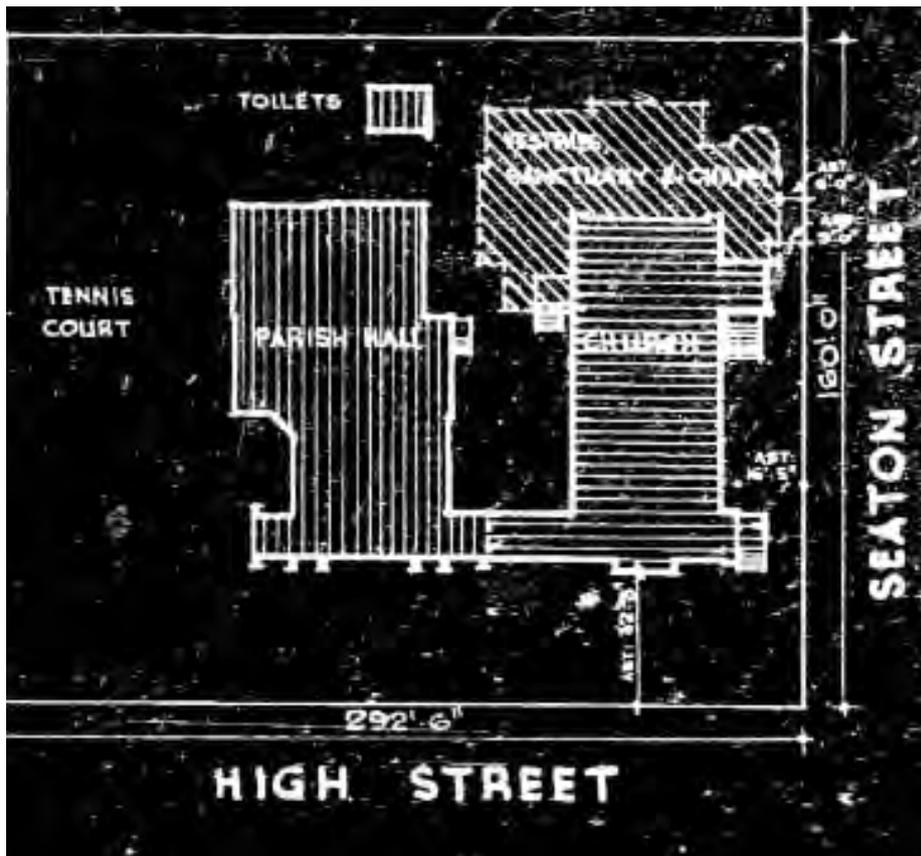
Proposed site plan of the new St Oswald's Anglican Church (date 1955). The old church building is referred to as Parish Hall in the plan. (Source: BP 16263)
